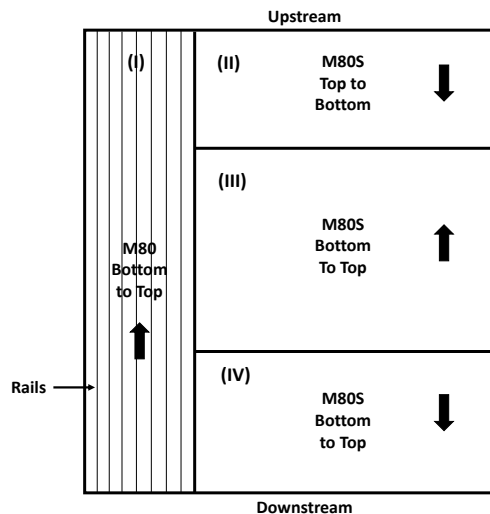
Direction of casting of concrete at sluice spillway at Radial Gate No. 3.
